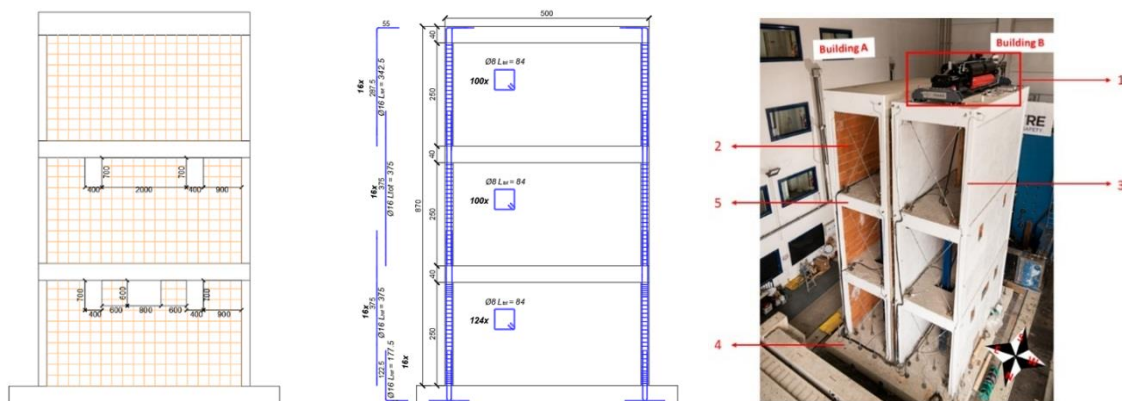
a) Elevation view of the buildings; b) Reinforcement details of the columns; c) The buildings tested in the Eucentre laboratory: 1) AMD; 2) masonry infills; 3) columns; 4) foundation slab connected to the shake table; 5) floor slabs.
